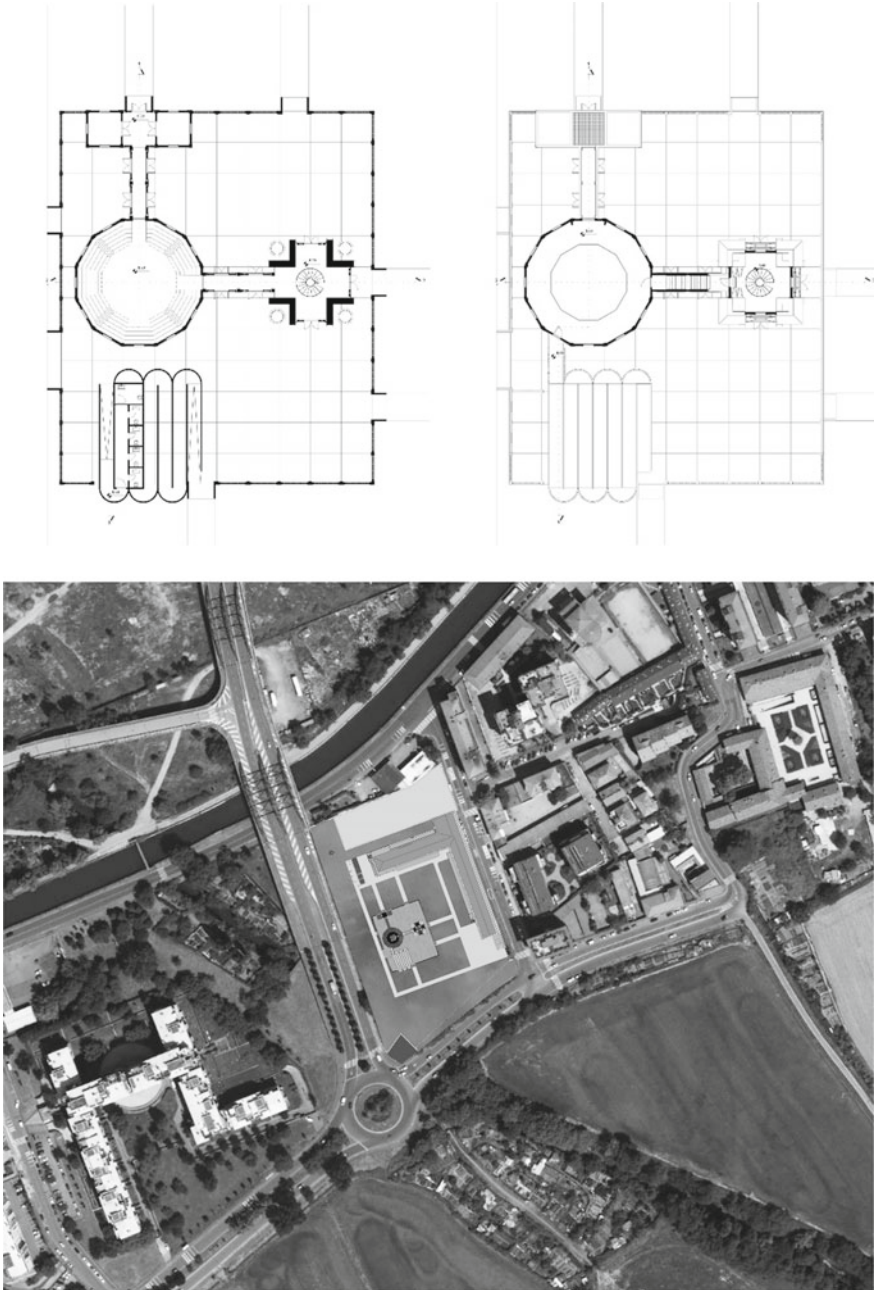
The pavilion “Carro di Tespi”. Ground floor plan, First floor plan, Masterplan
